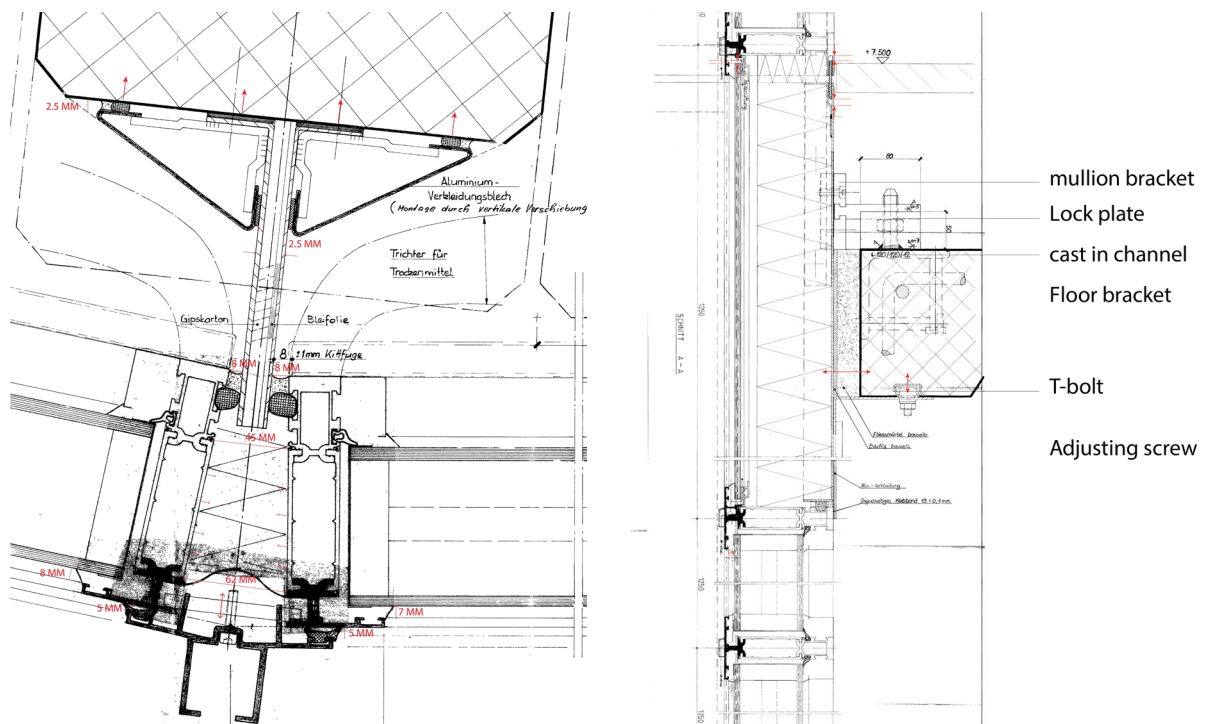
The red lines mark tolerances in the facade elements. Source: Author drawings were provided by Alkondor
